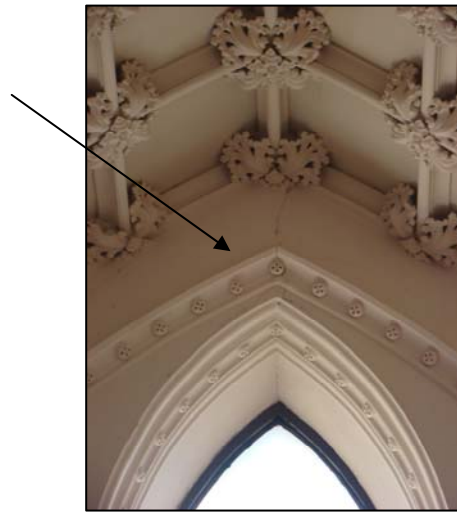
Arrows point to cracks due to weakened structure. (Photo: Author)
